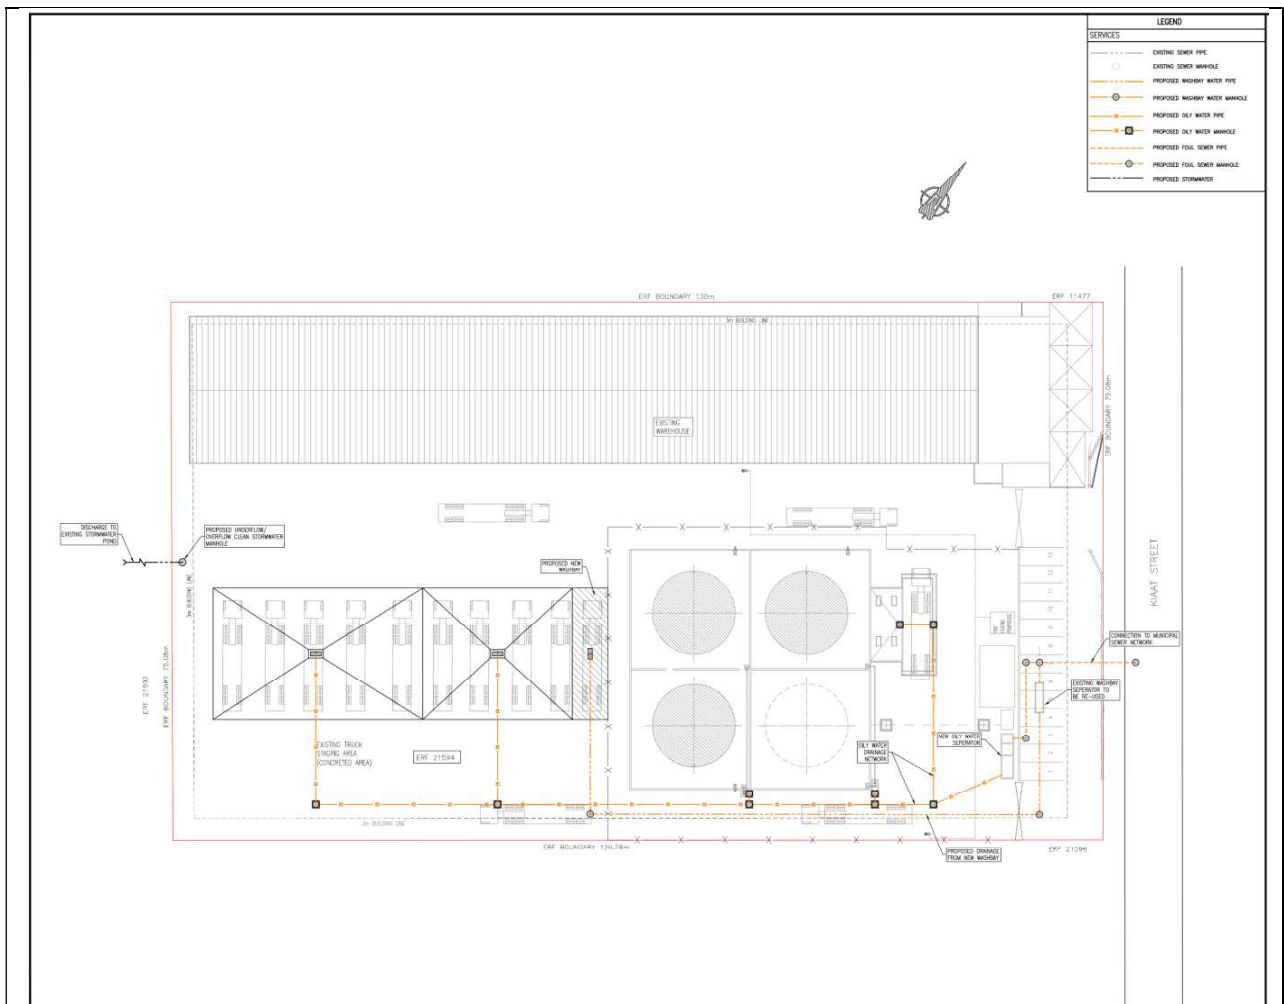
Drawing depicting the proposed storm water reticulation design, as per Annexure A of the Stormwater Management Plan
